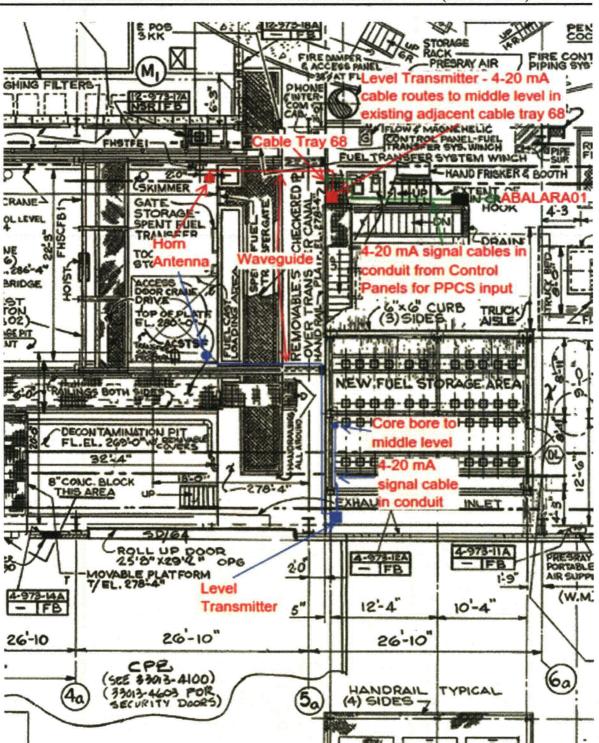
Plan View of SFP Showing New SFP Water Level Instrumentation
